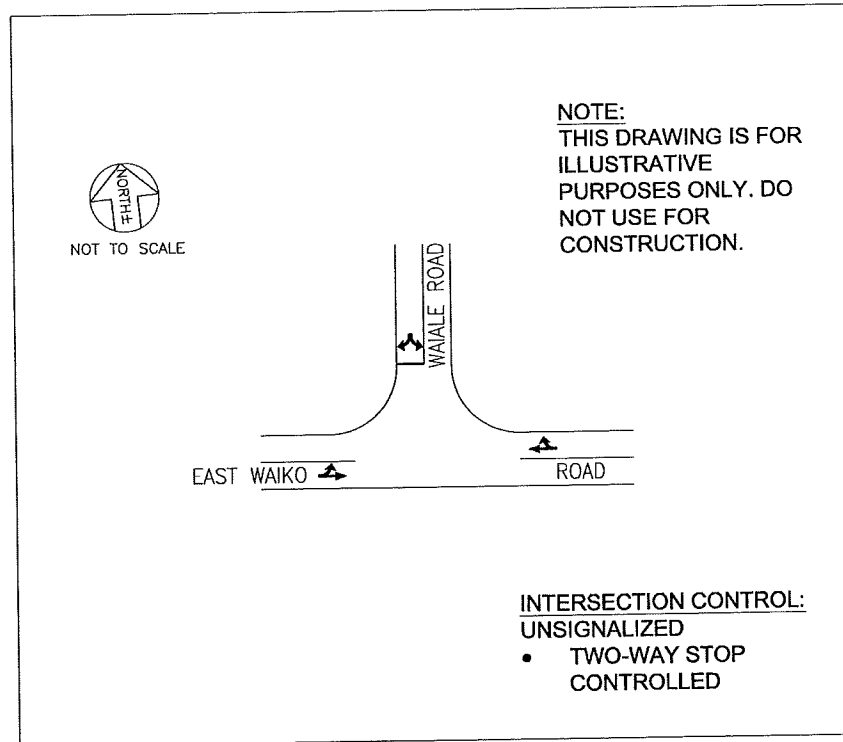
Existing Lane Configuration at Waiale Road/East Waiko Road
